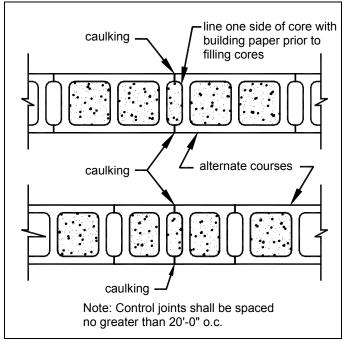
TYPICAL CONTROL JOINT DETAIL
